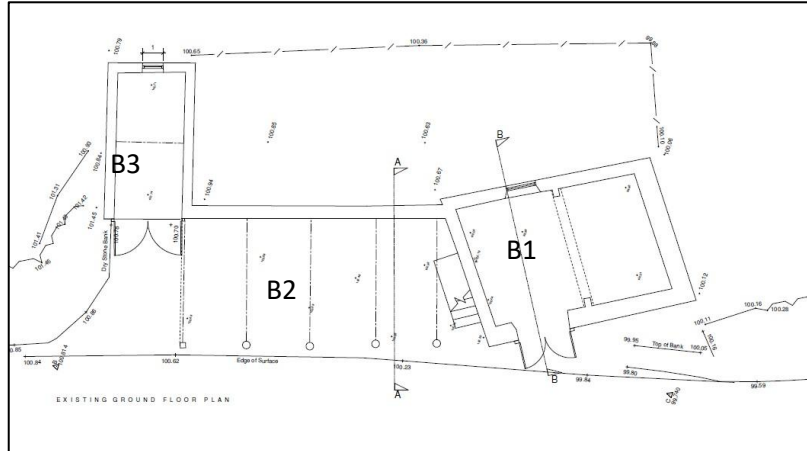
EXTRACT OF THE EXISTING FLOOR-PLAN, BY DEBORAH SOMERVILLE CHARTERED ARCHITECTS, ANNOTATED BY SWARCH.
